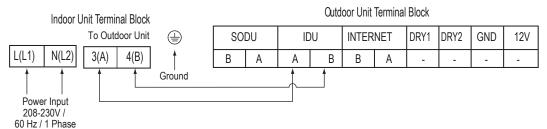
Simplified View of Indoor Unit Terminal Connections—SV Wall-Mounted Frames.
